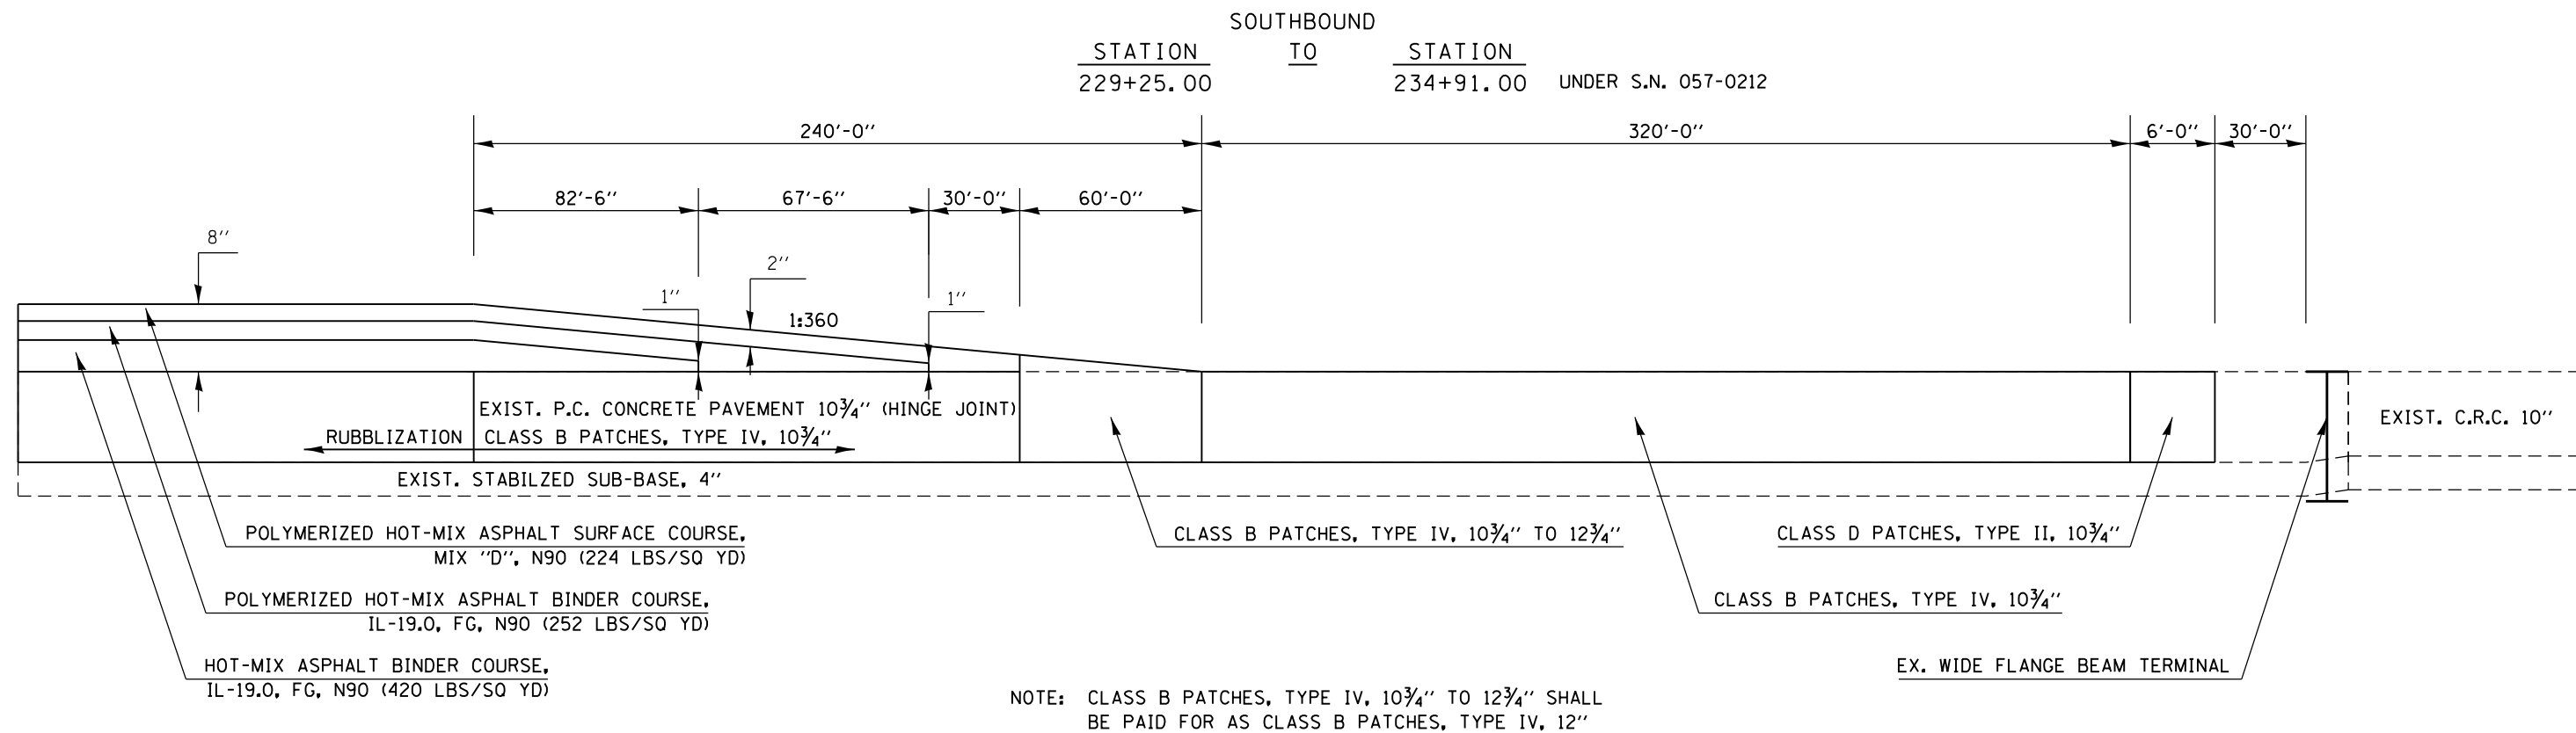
SHOULDER PAVING TRANSITIONS UNDER S.N. 057-0213
